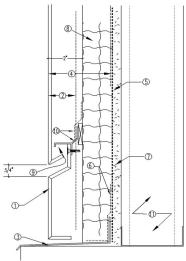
Typical horizontal joint detail for rainscreen PER panel system
